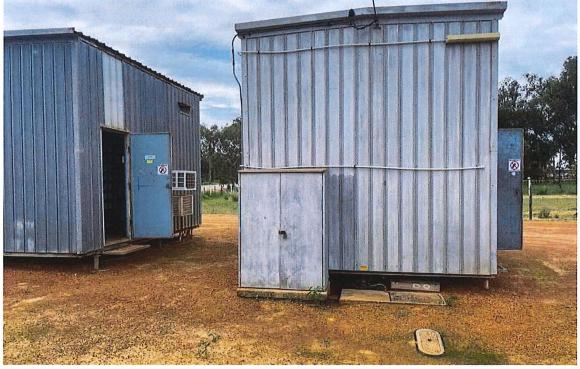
INTERNAL VIEW OF SITE LOOKING EAST
